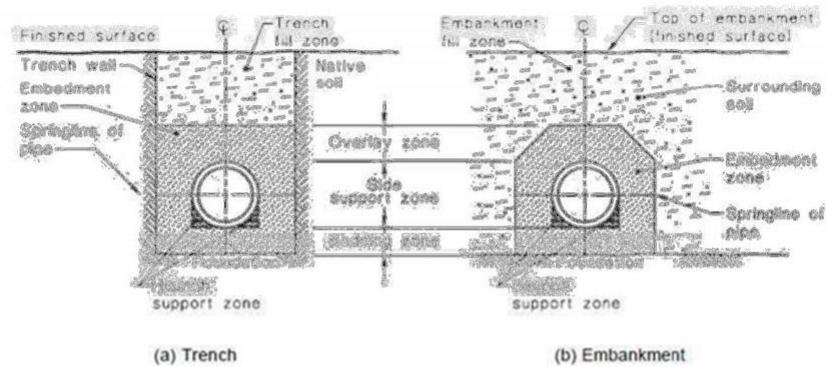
BURIED FLEXIBLE PIPE INSTALLATION—TERMINOLOGY
